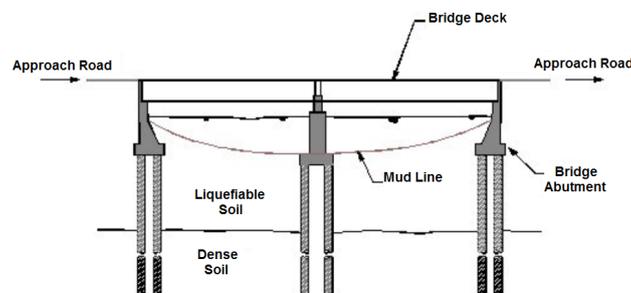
Schematic diagram of a typical two span bridge showing the abutment and pier foundations.
